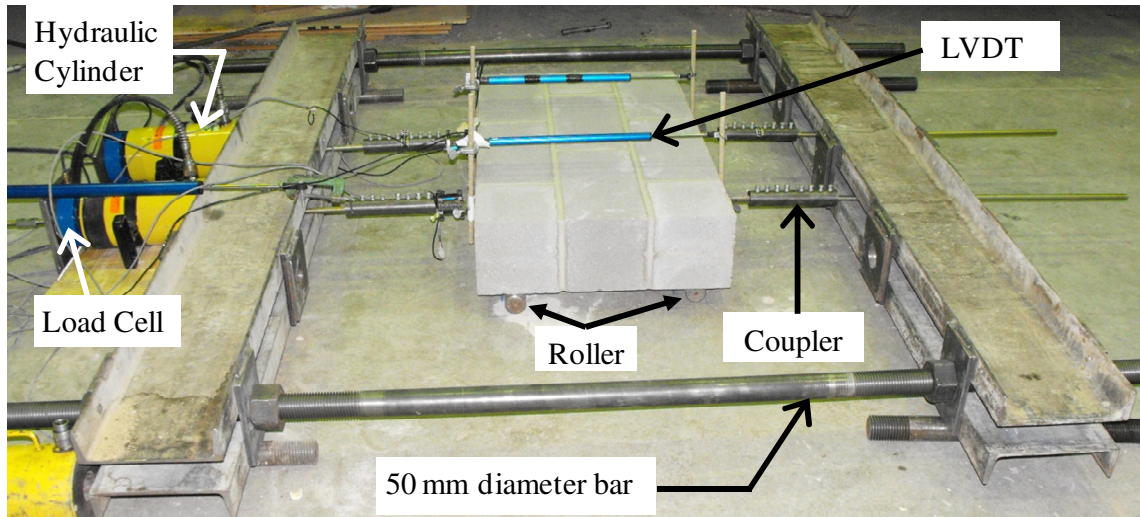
Test setup and instrumentation for the double pullout specimens.
